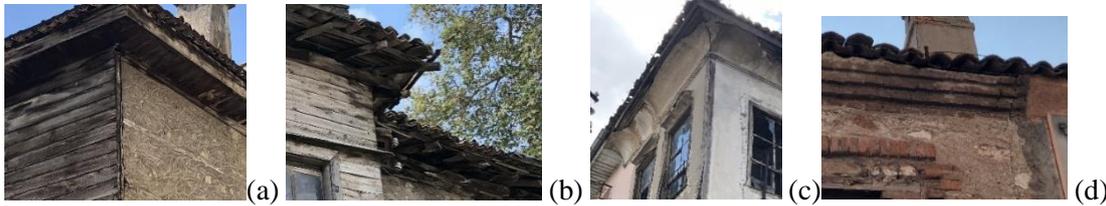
Eaves of traditional Eğırdir houses; (a) closed soffit, (b) open soffit, (c) profiled soffit, (d) brick saw-teeth “kirpi” eave
